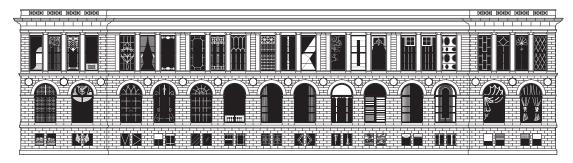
Elevation, Chicago Cultural Center East Façade.
